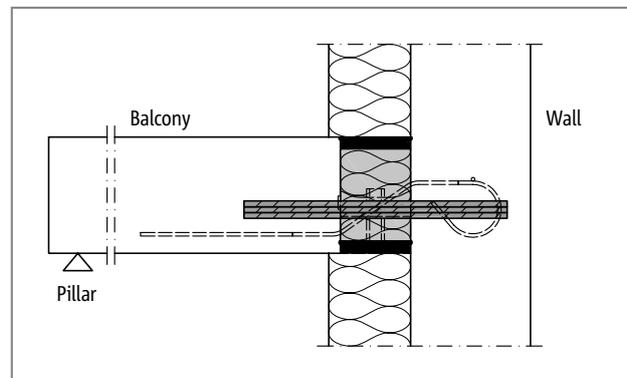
Schöck Isokorb® XT type Q, H-VV-NN: Connection to a reinforced concrete wall with external insulation
